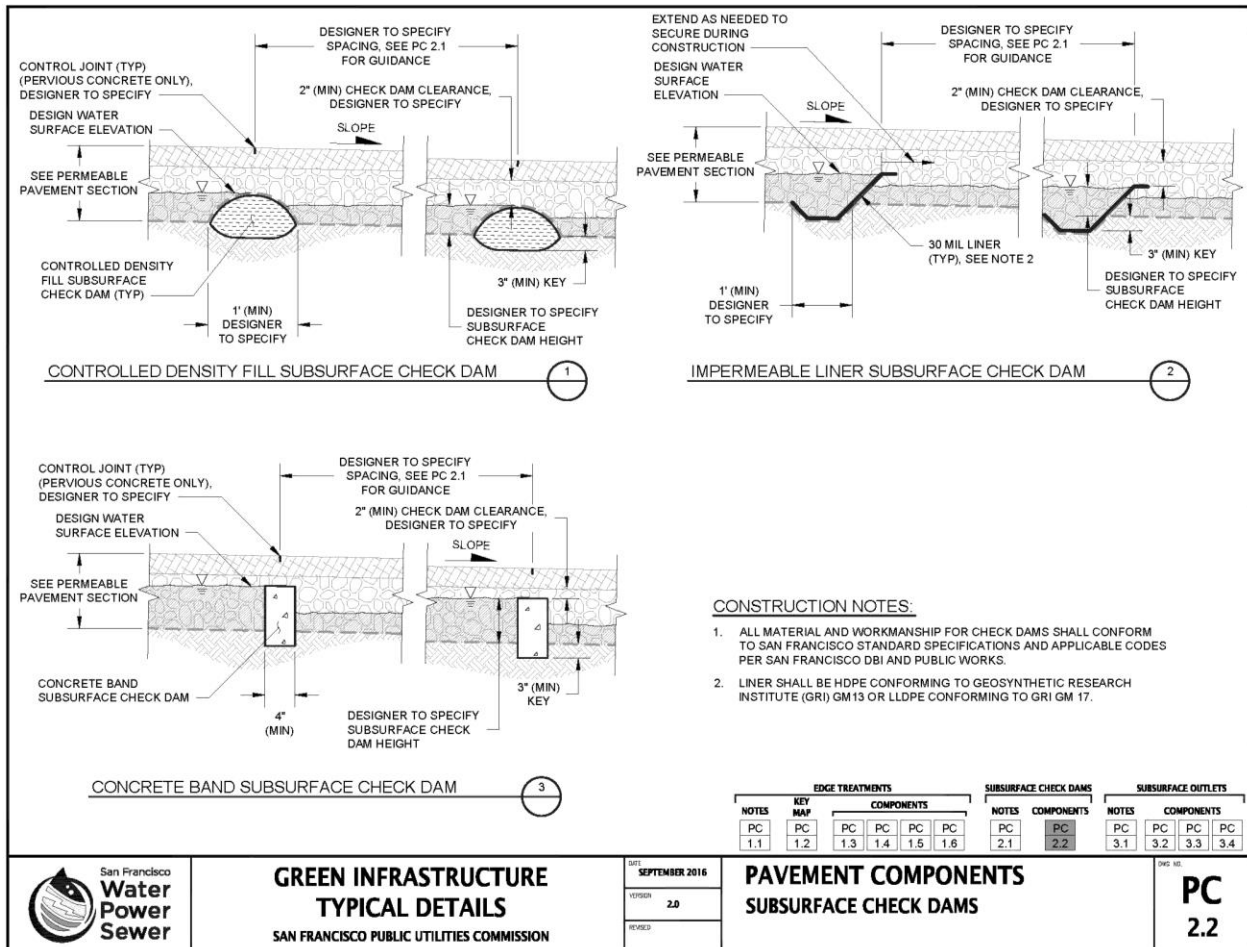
Subsurface Check Dam Details – PC 2.2 from the GI Design Guide (Credit: SMCWPPP Sustainable Streets Typical GI Details and SFPUC)
